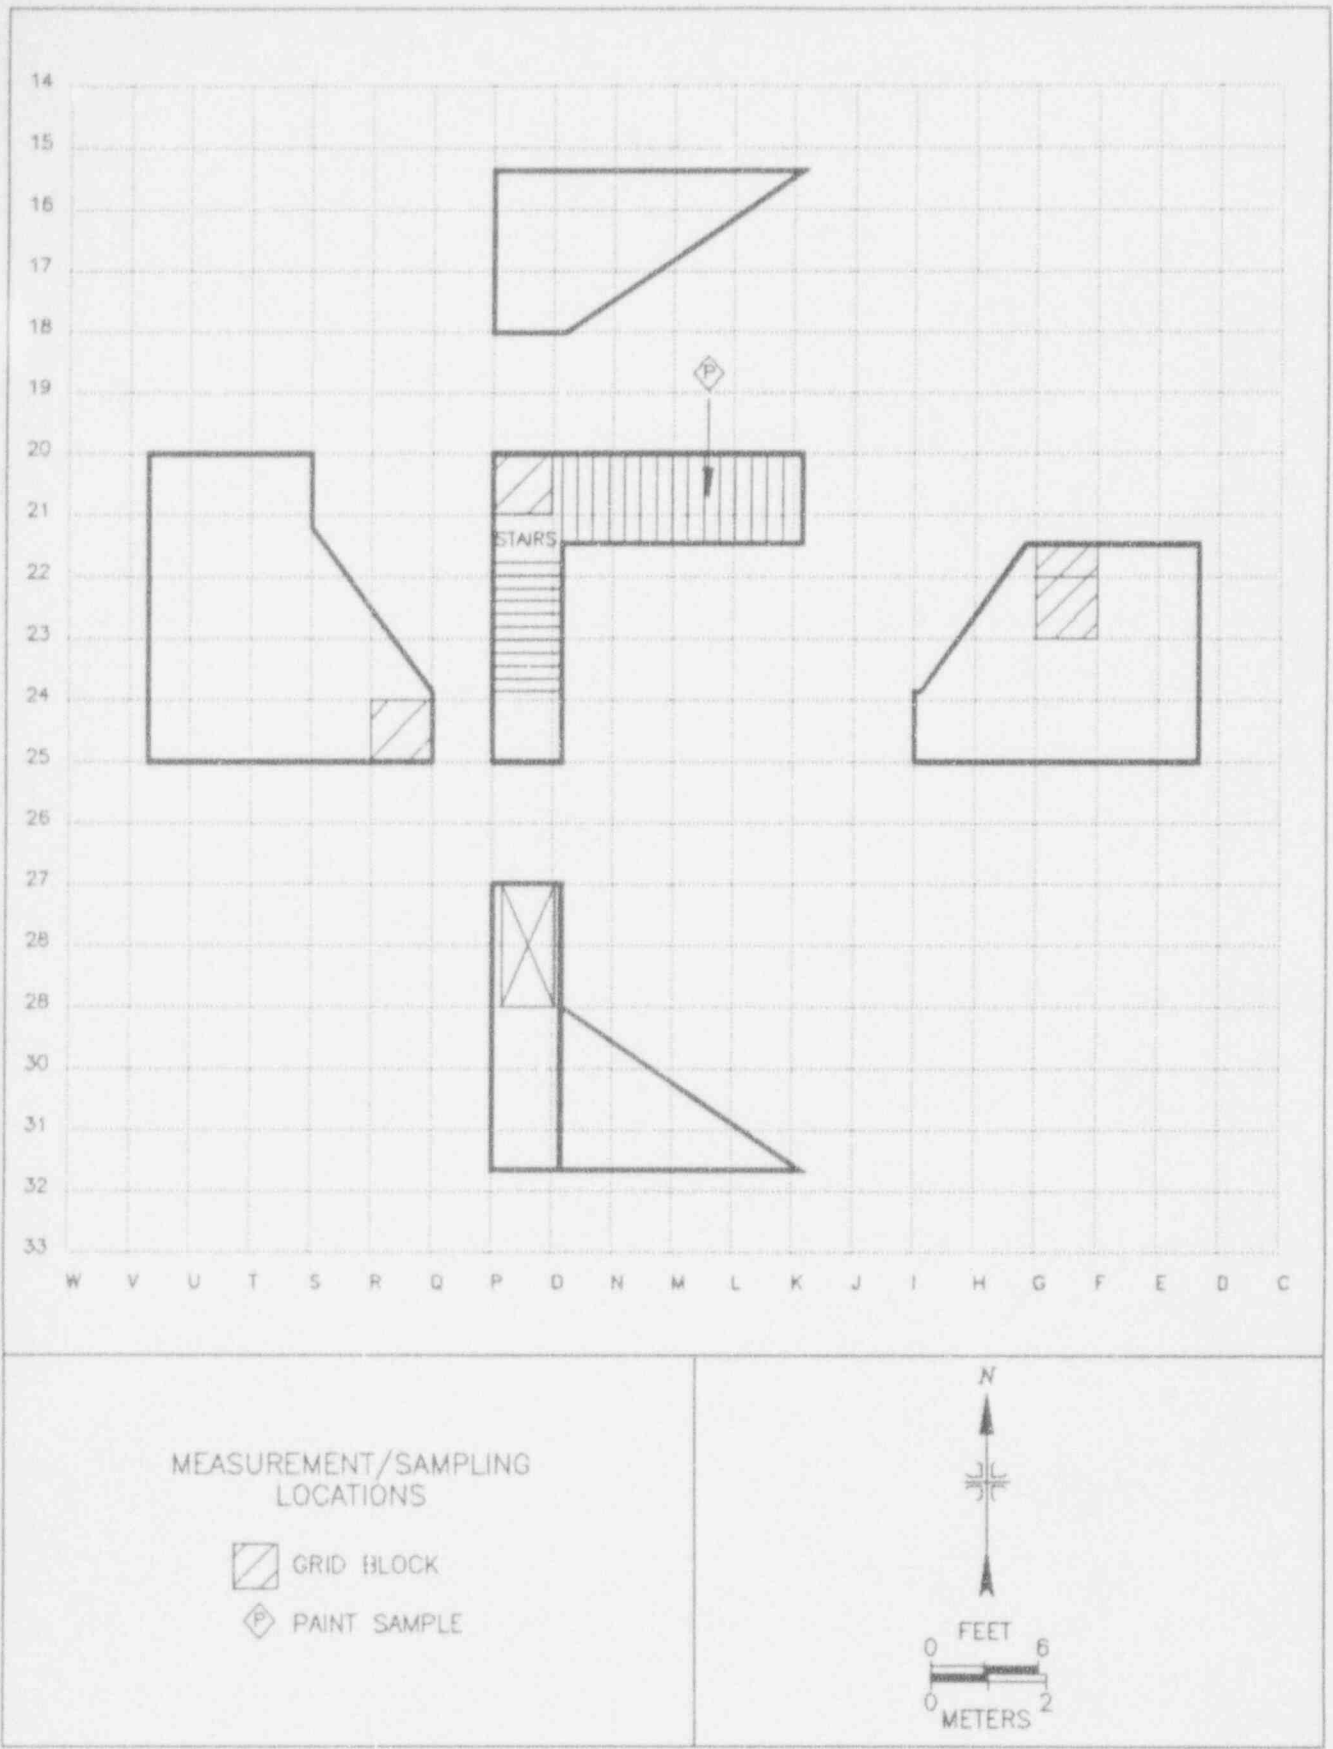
Basement, Radwaste Stairs – Measurement and Sampling Locations
